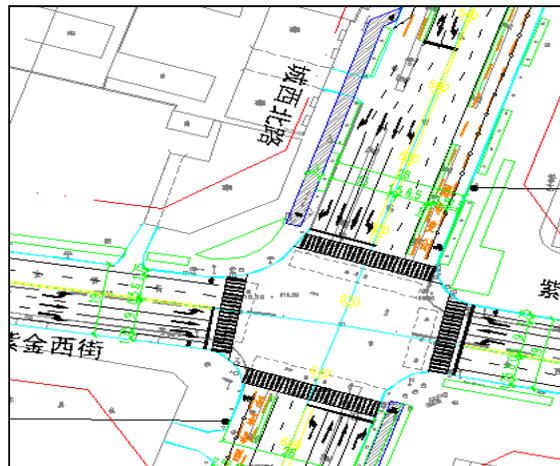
intersection Channelization (Chengxi Road and Zijin Street)
